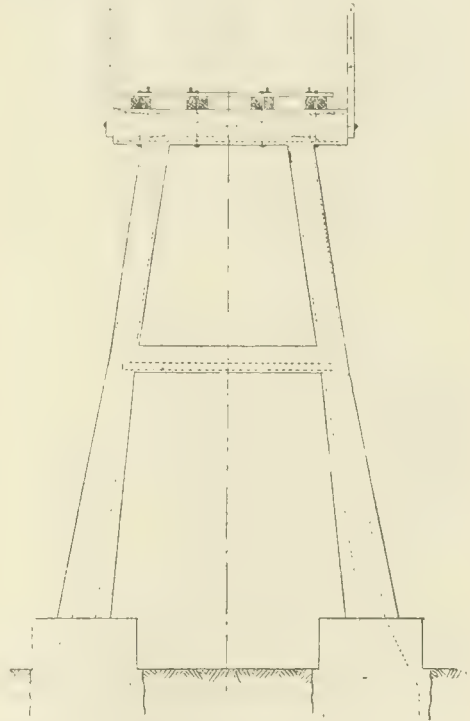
CONCRETE GANTRY LEG; REINFORCEMENT SHOWN IN DOTTED LINES.
